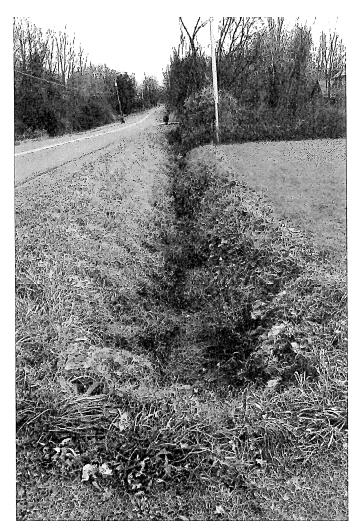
Exit culvert from the end of the ditch catch basin; undersized; facing west
